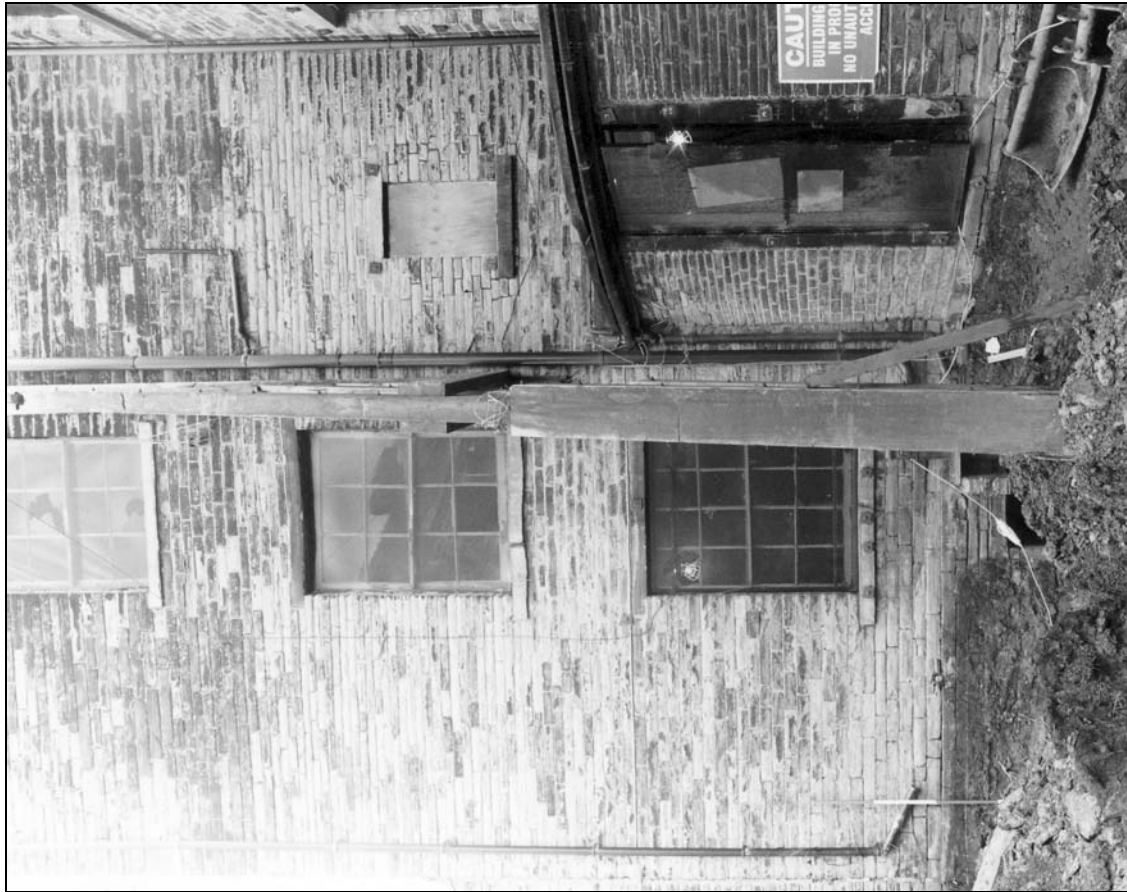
The original west gable of the north wing, with porch at bottom right (film 5, frame 8)
